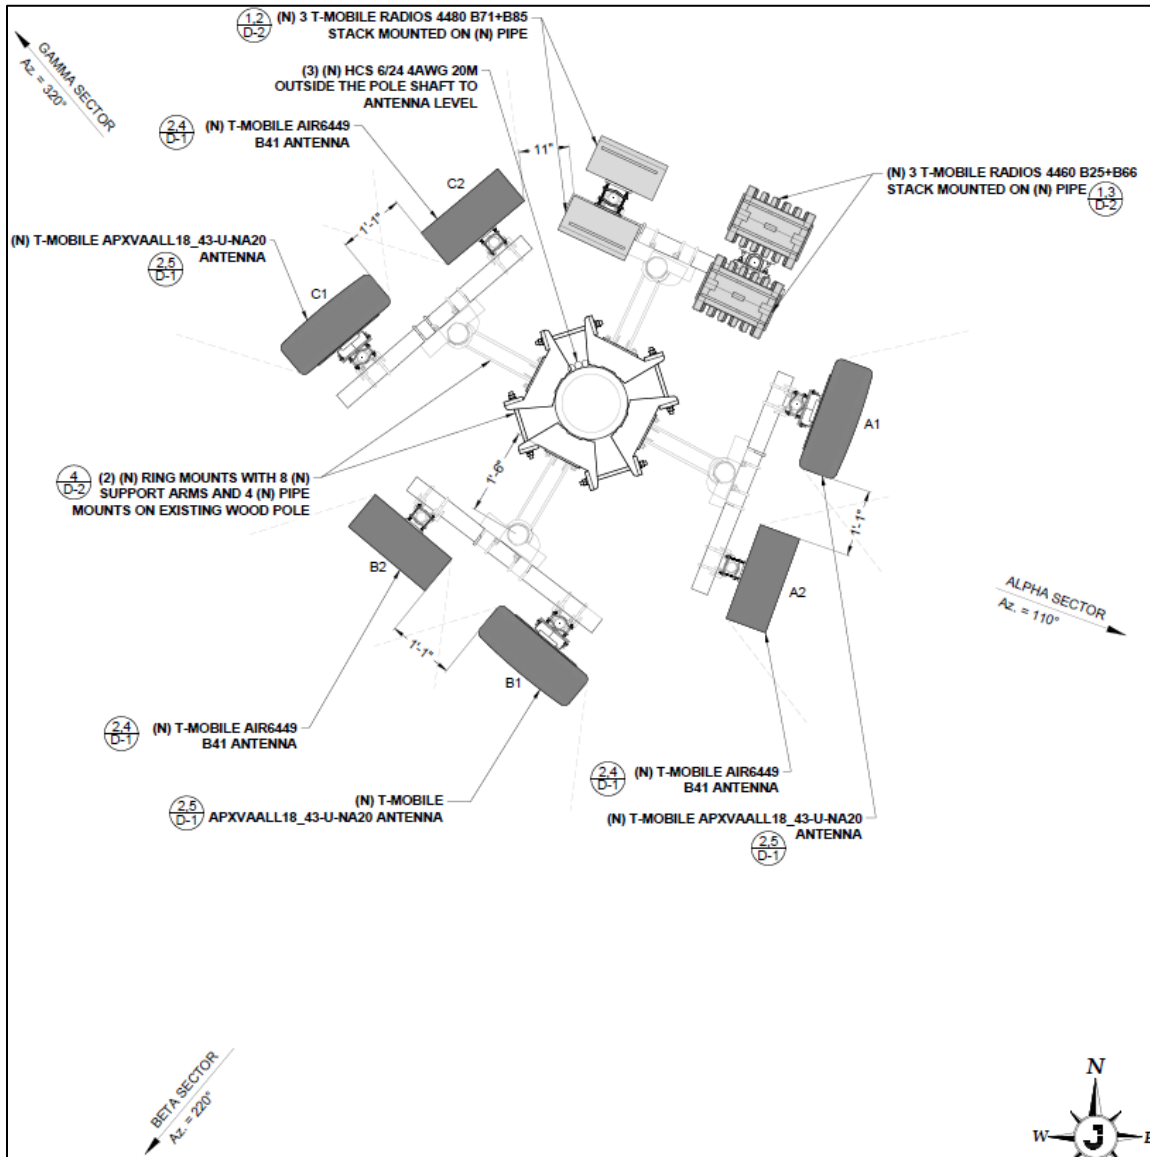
Proposed antenna layout plan on the monopole (Source: Plans, page A-3, panel 1).
